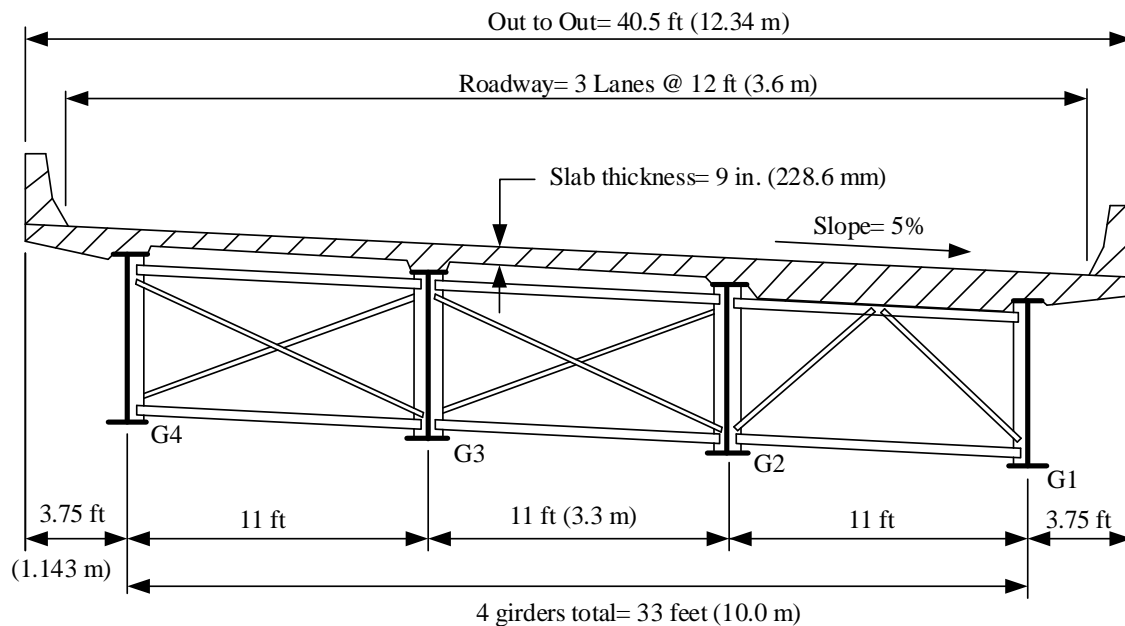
The NCHRP Project 12-52 bridge cross-section
